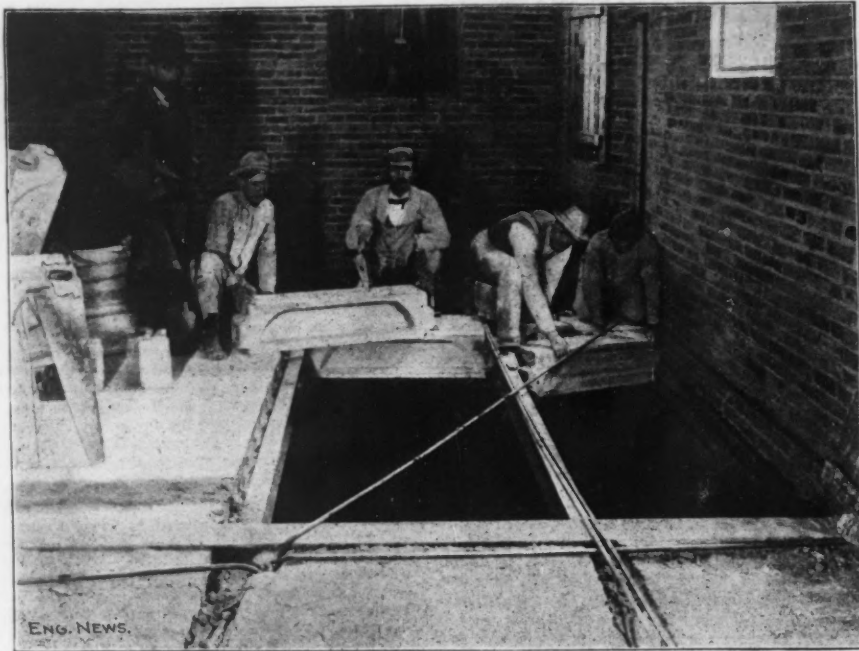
MACKOLITE FIREPROOF FLOOR BLOCKS. Showing Method of Laying.
